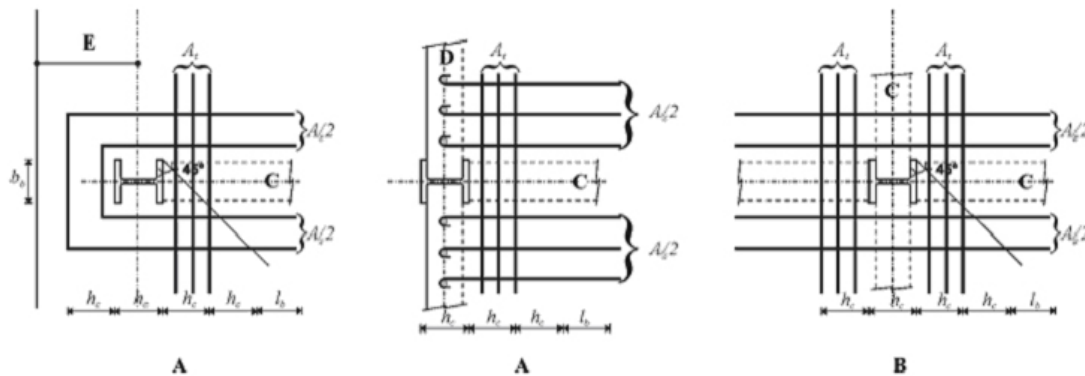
Detailing rules for seismic rebars in interior and exterior joints
